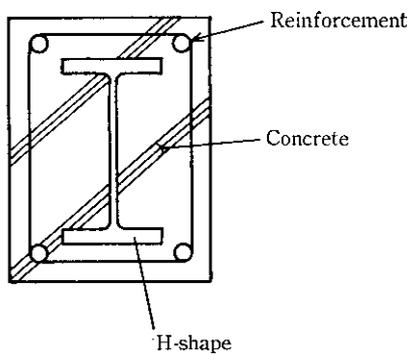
Construction of SRC (steel and reinforced concrete) structure
